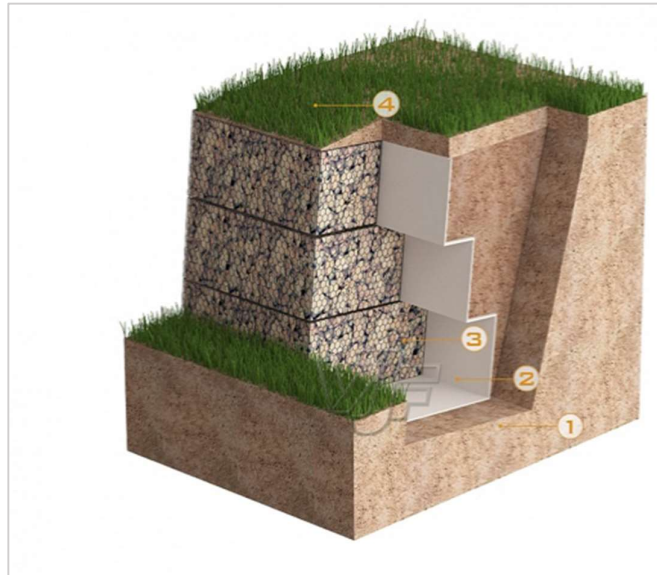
Typical Gabion Wall for Erosion Protection on Steep Slopes
